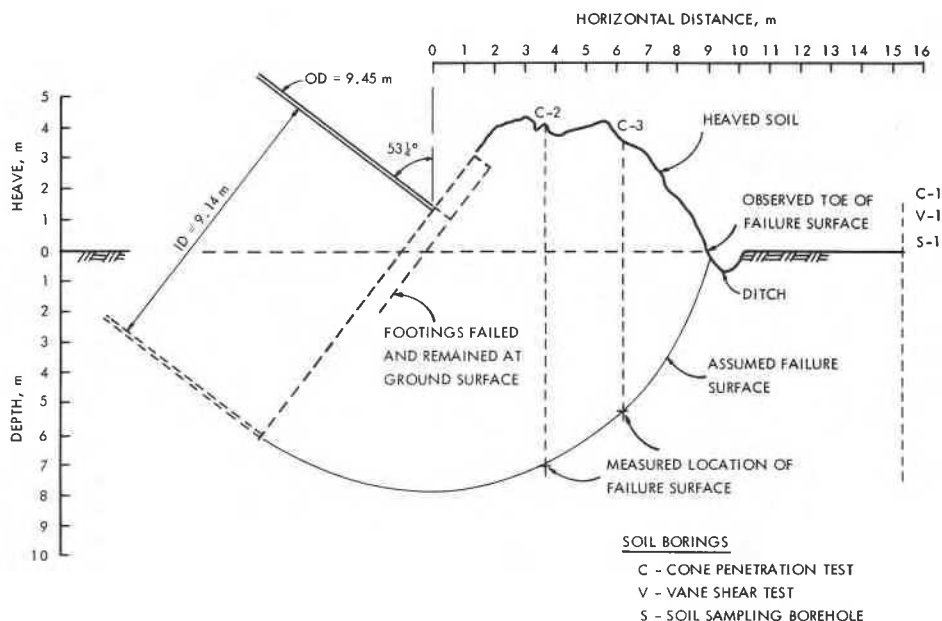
Richmond silo after failure showing silo heave, location of sliding surface and location of soil borings.
